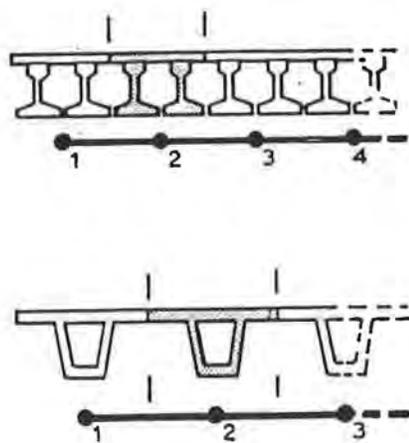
Deck Cross-Section Divided into 'Beams' (16)
